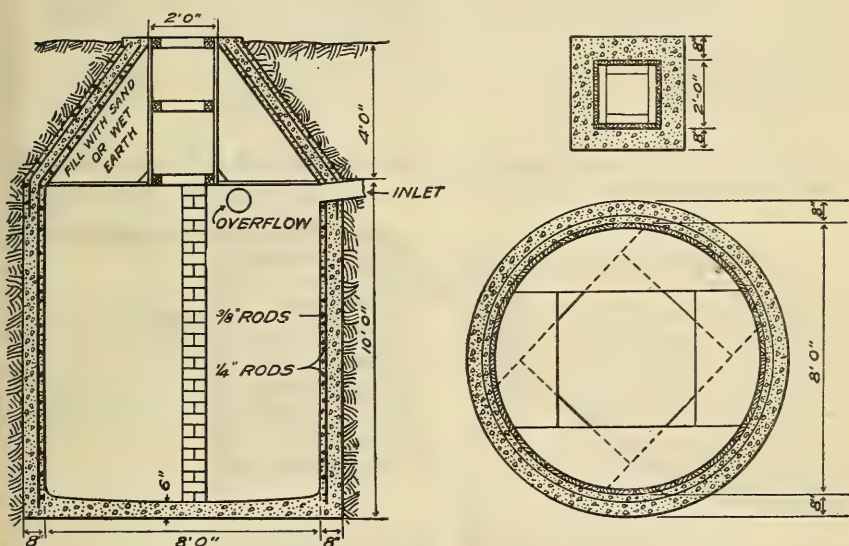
Reinforced concrete cistern, showing arrangement of forms and reinforcing.
